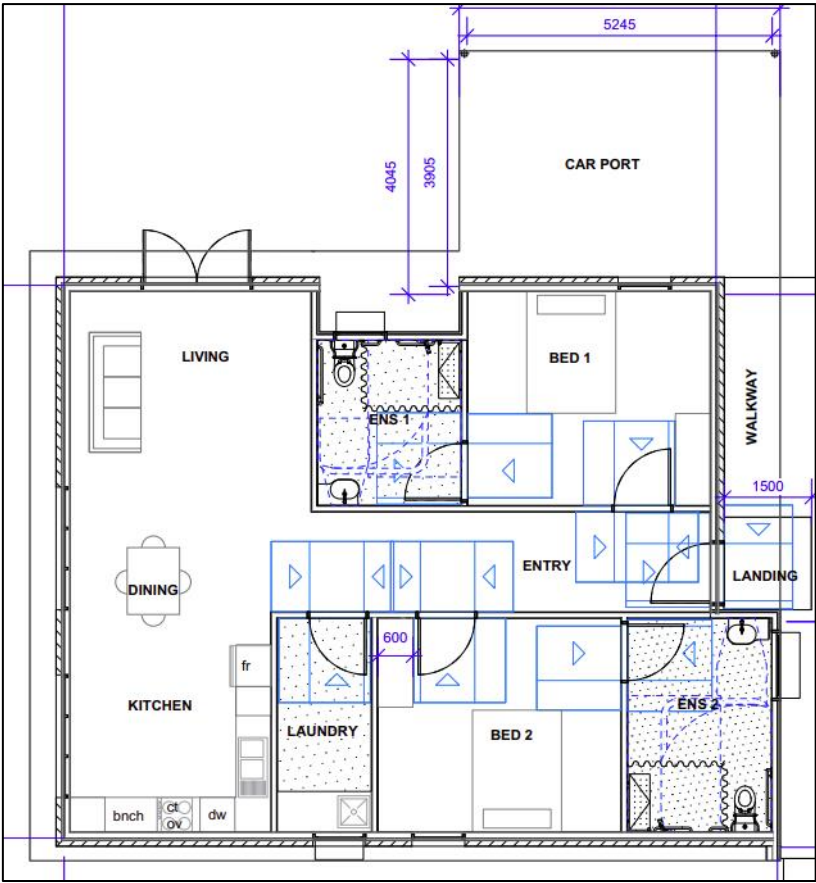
Floor plan – units 1-3 (Source: S Group)
